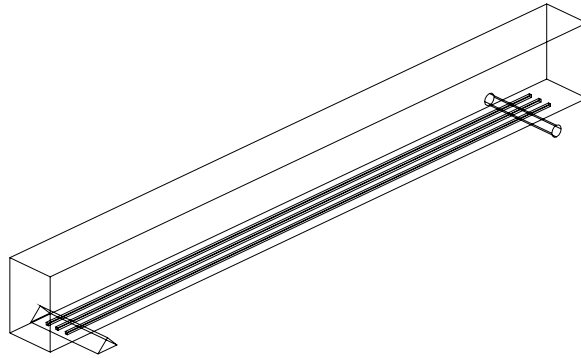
Near surface mounted reinforcement (NSMR) rods attached to the tensioned side of the concrete beam.
